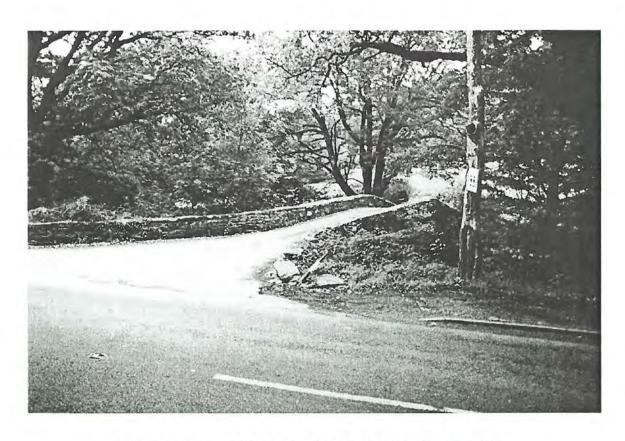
Site 99, Pont-ar-Lledr, general view showing wing walls
